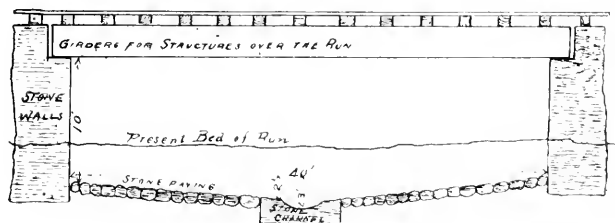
PROPOSED IMPROVED CHANNEL OF POGUE'S RUN.
